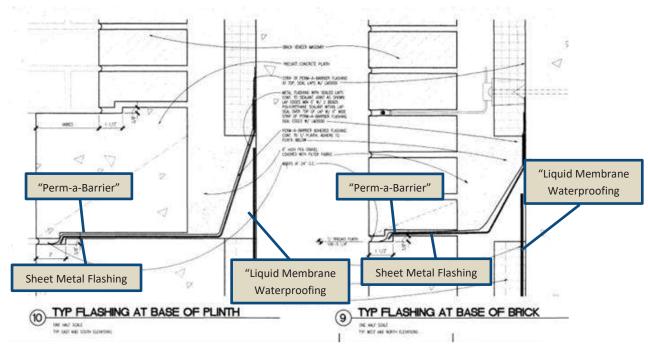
Details A-8.10/9 and A-8.10/10, excerpted from the Project Record Drawings showing the base of the brick veneer cladding system in section view. The depicted details call out a flexible flashing membrane installed over a rigid sheet metal flashing at base of brick through veneer locations and shows similar through veneer flashing at brick ledger locations. BET&R observed a laminated type flashing in use at select locations.
